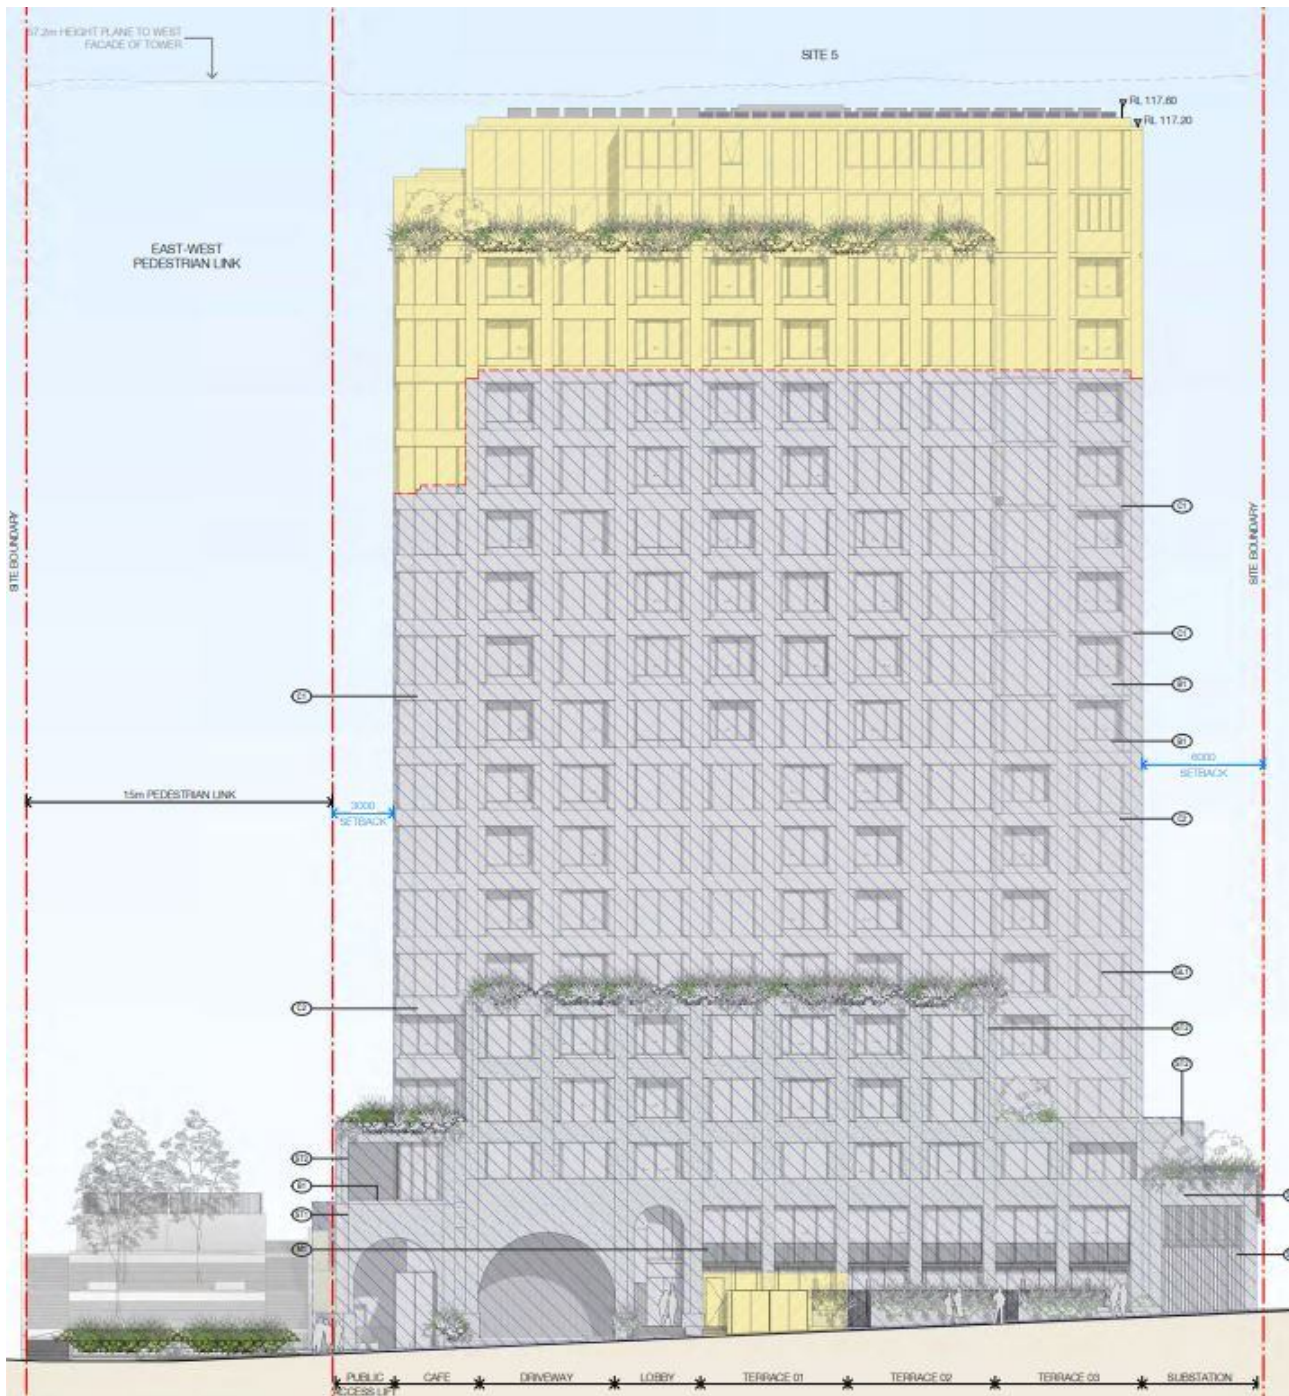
East elevation viewed from Canberra Avenue (Source: Applicant)
